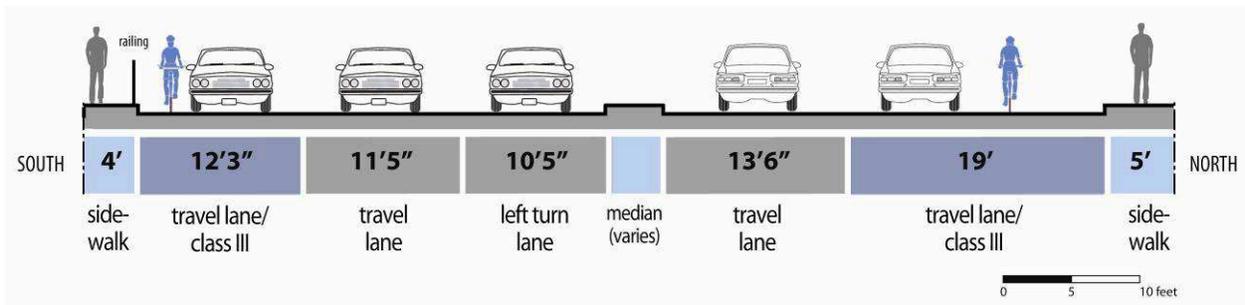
Second Street (Approximately 25' West of G Street Intersection)
